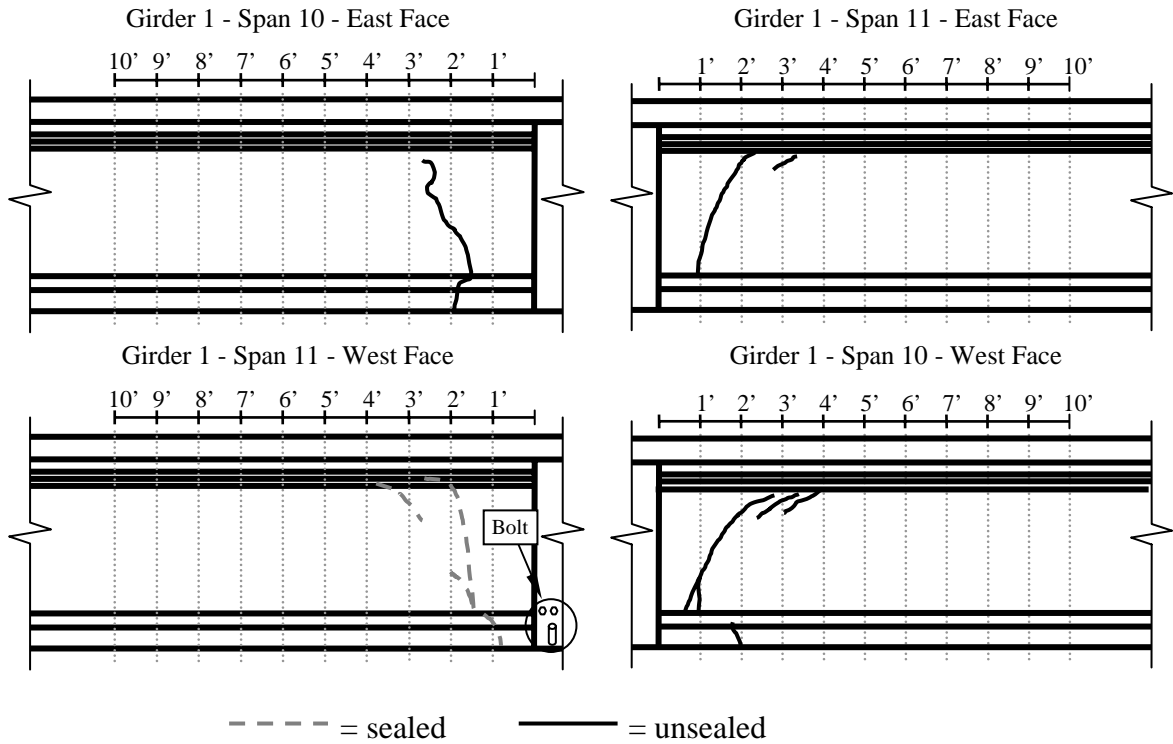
Girder Line 1 Cracking (Fason and Barnes 2004)
